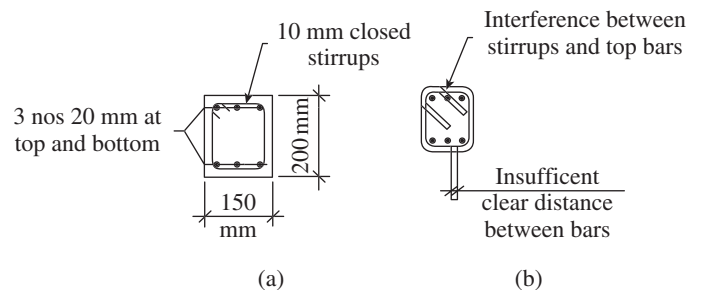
Assumed conditions in drawings resulting in difficulties at site (a) Details as given by engineer (b) Actual condition at site
